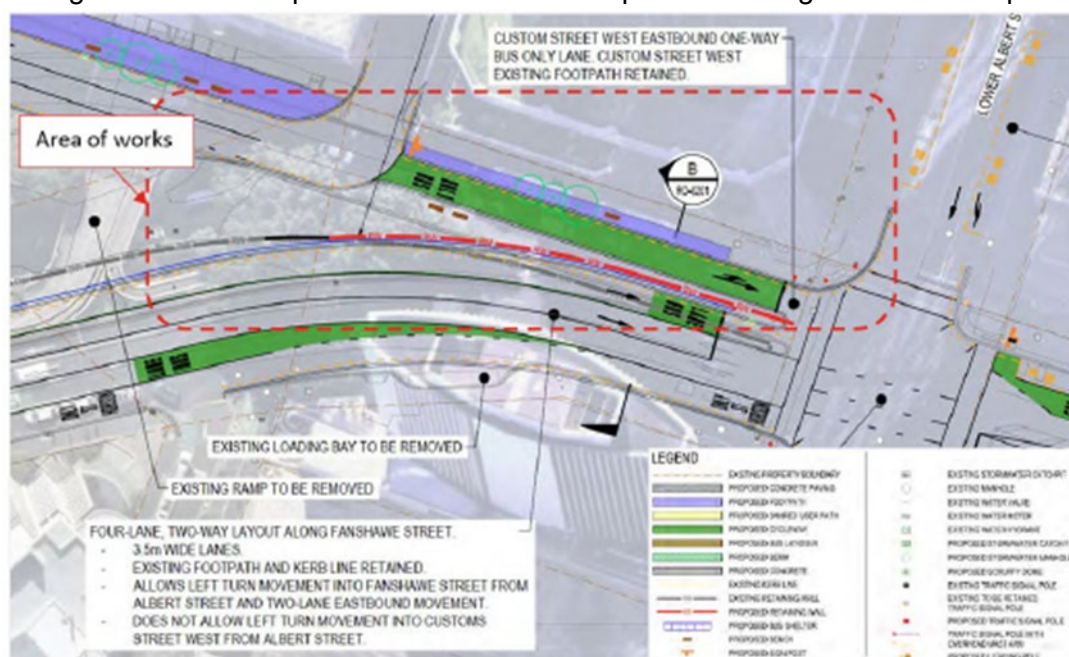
Retaining Wall Realignment General Arrangement Plan
